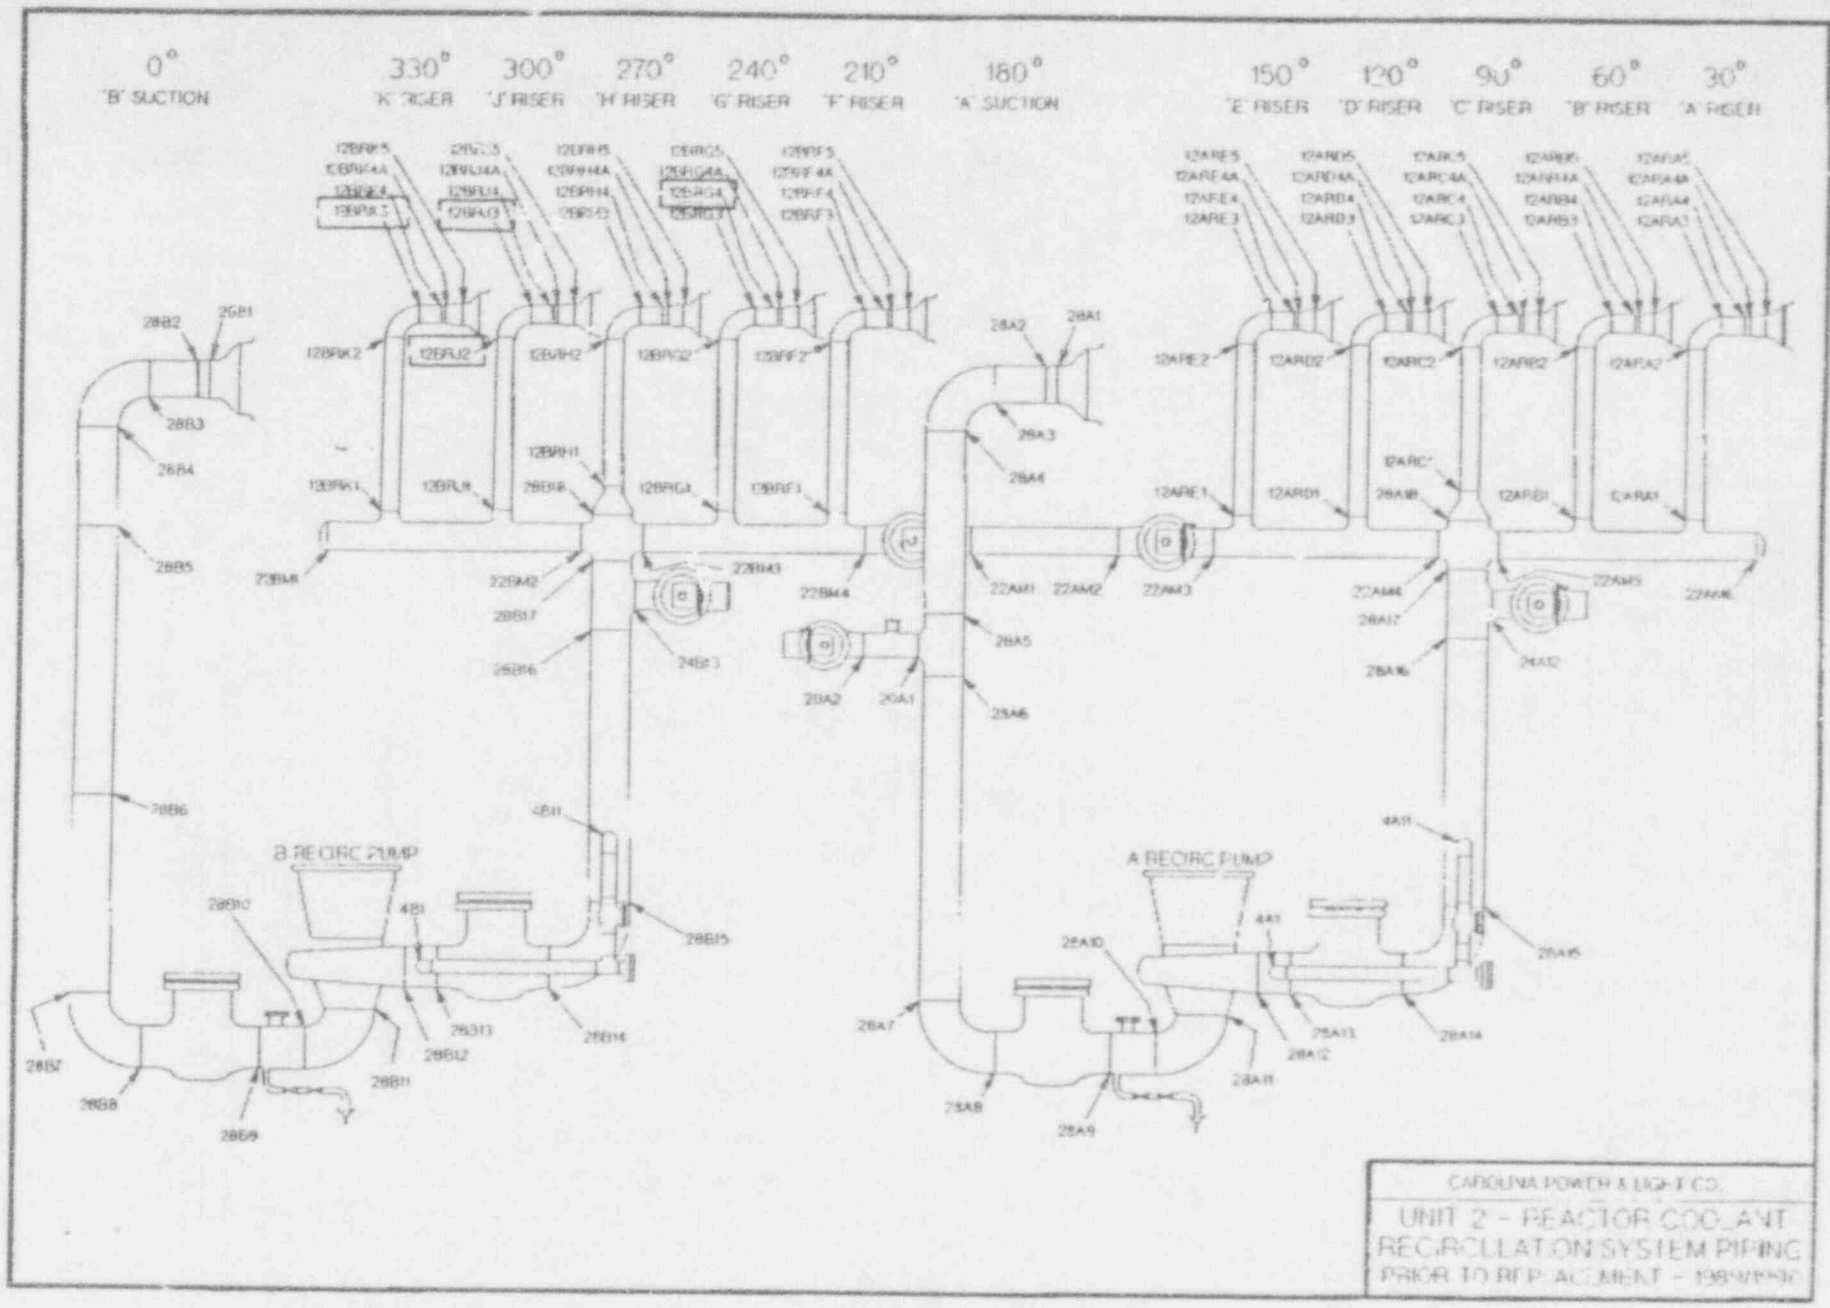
Layout of Reactor Recirculation System and location of the four weld samples (BRK3, BRG4, BRJ2, and BRJ3 - boxed).
